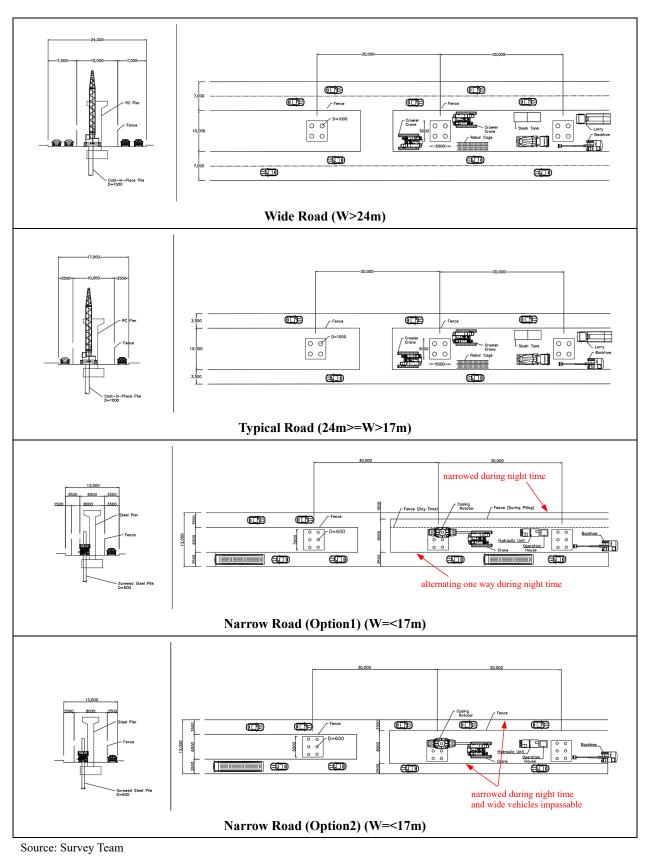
Typical Layout of the Construction Work Space Arrangement
